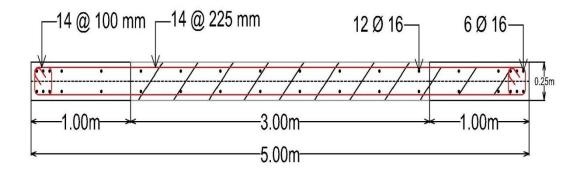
Steel reinforcement of shear wall with opening 3.0mx2.0m (Window)
